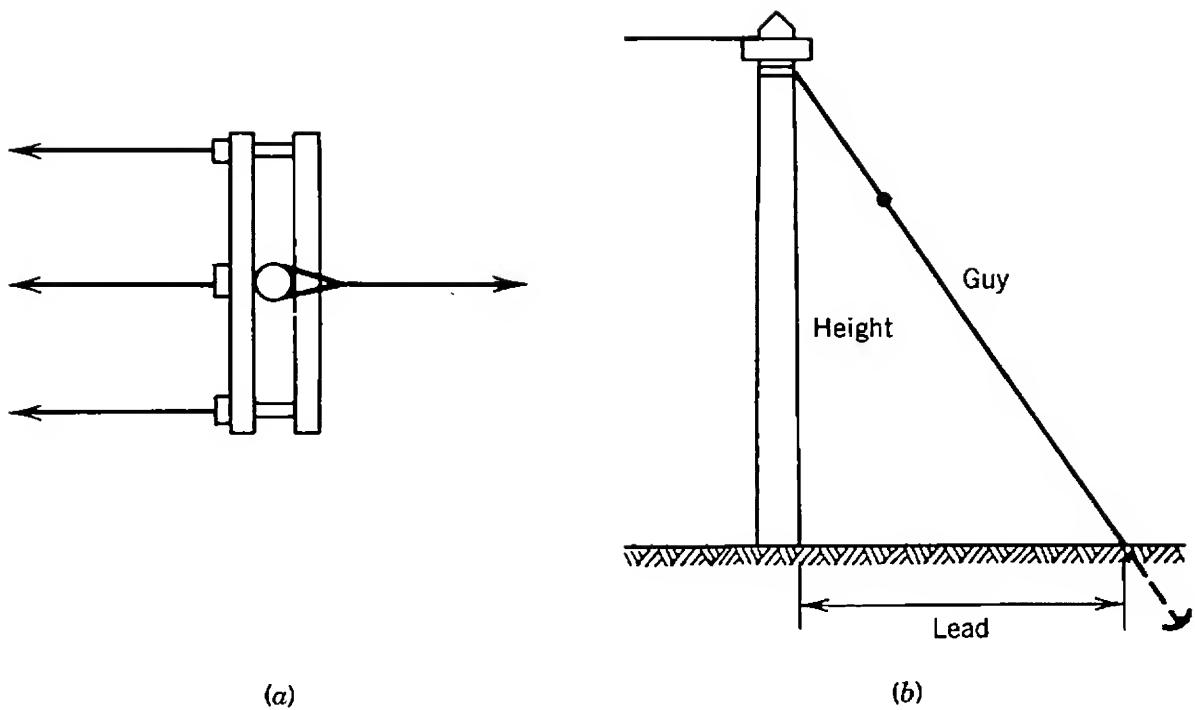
Dead-end guy installation: (a) plan; (b) elevation.
